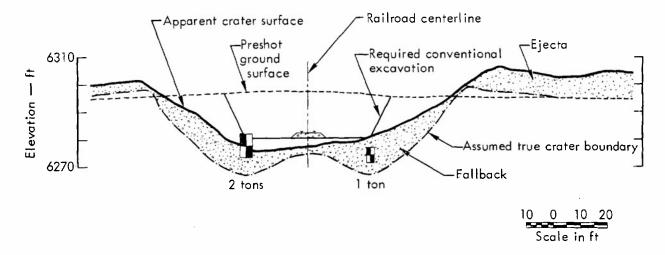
Typical cross section of Project Trinidad railway cut (at station 94+60).
